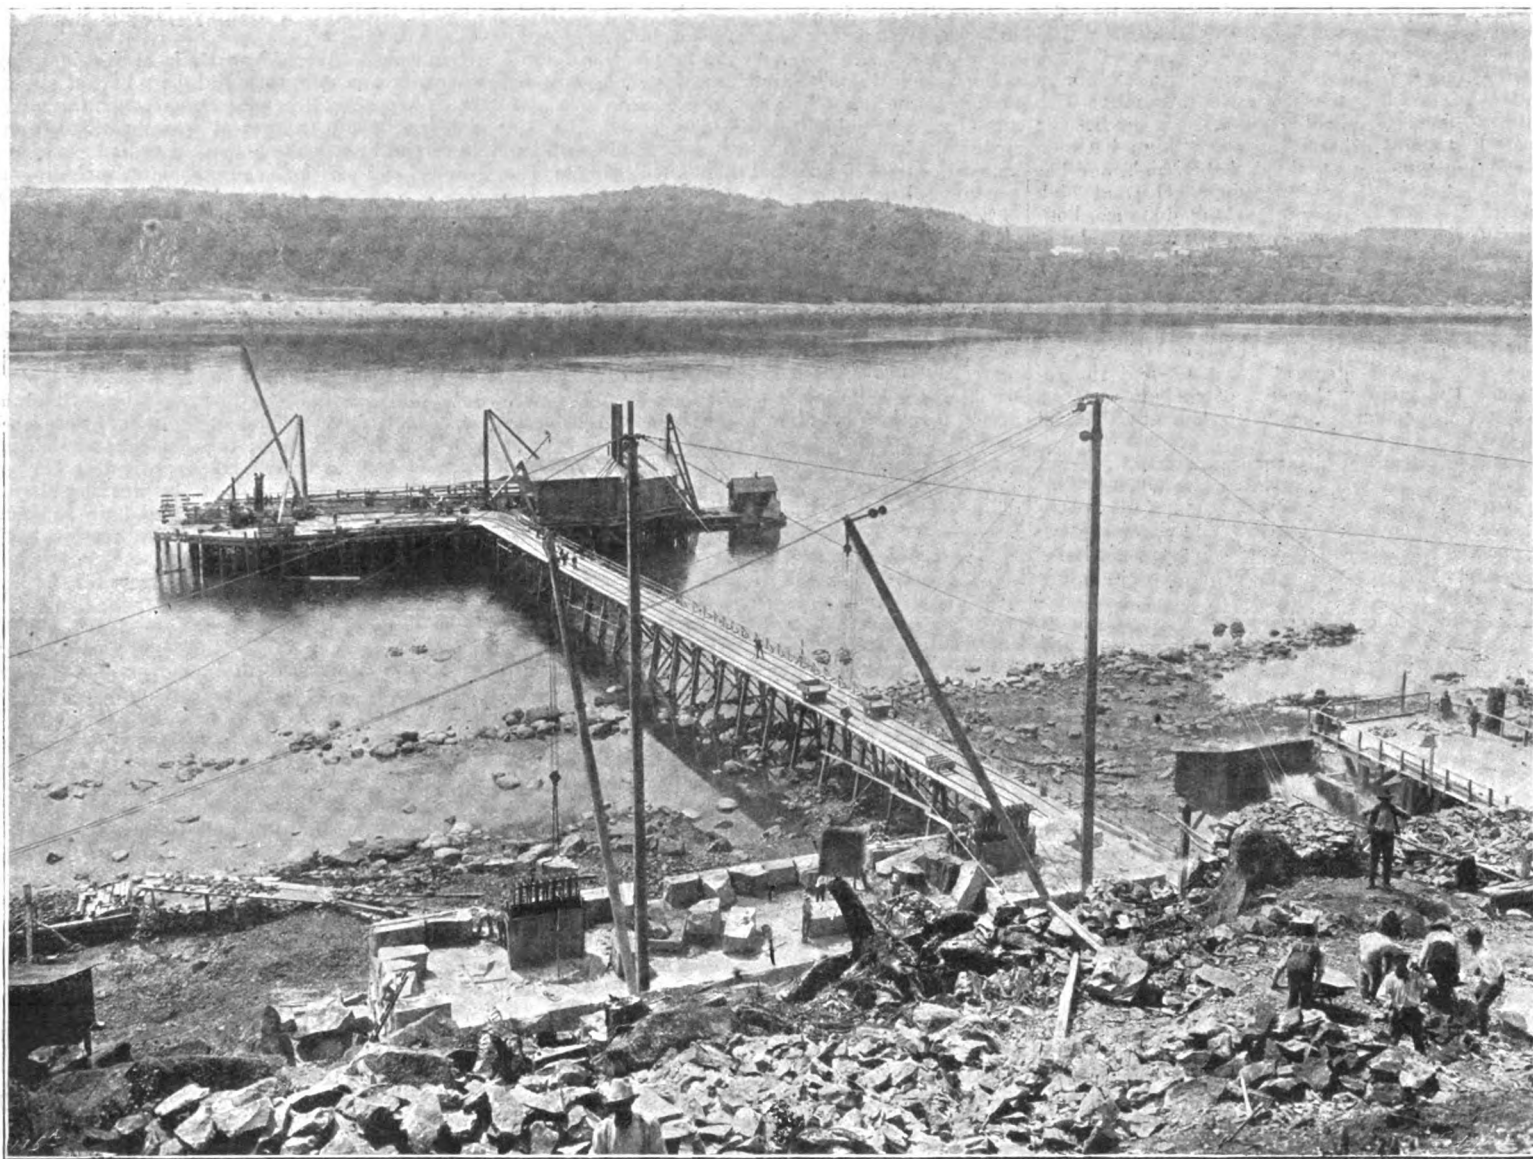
VIEW ON NORTH BANK, SHOWING ANCHOR AND RIVER PIERS; JUNE 25, 1901.
